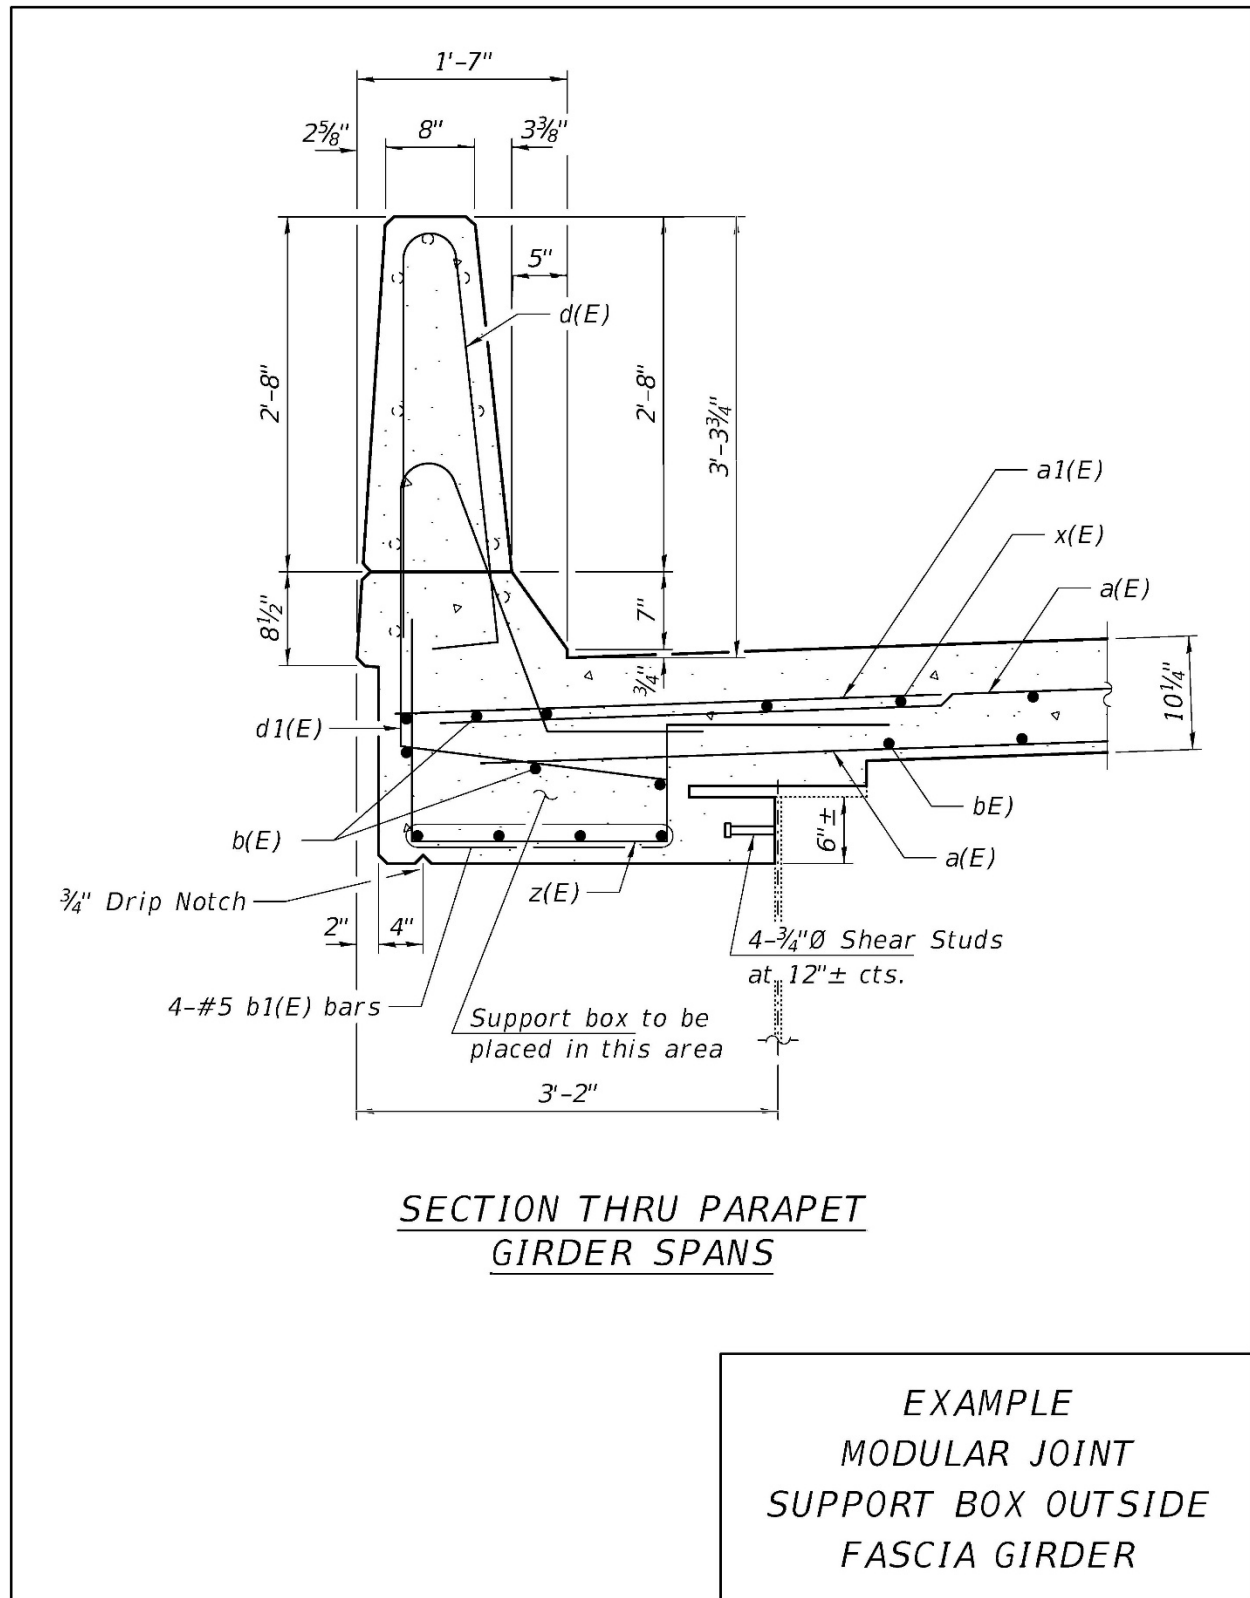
Example – Modular Joint Support Box Outside Fascia Girder
